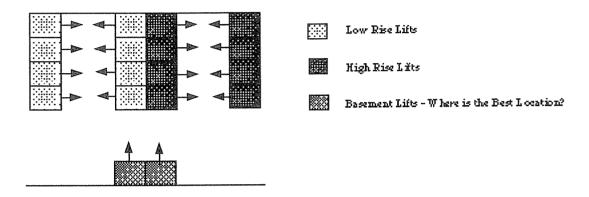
Two Zone Lift System With Separate Basement Lifts
